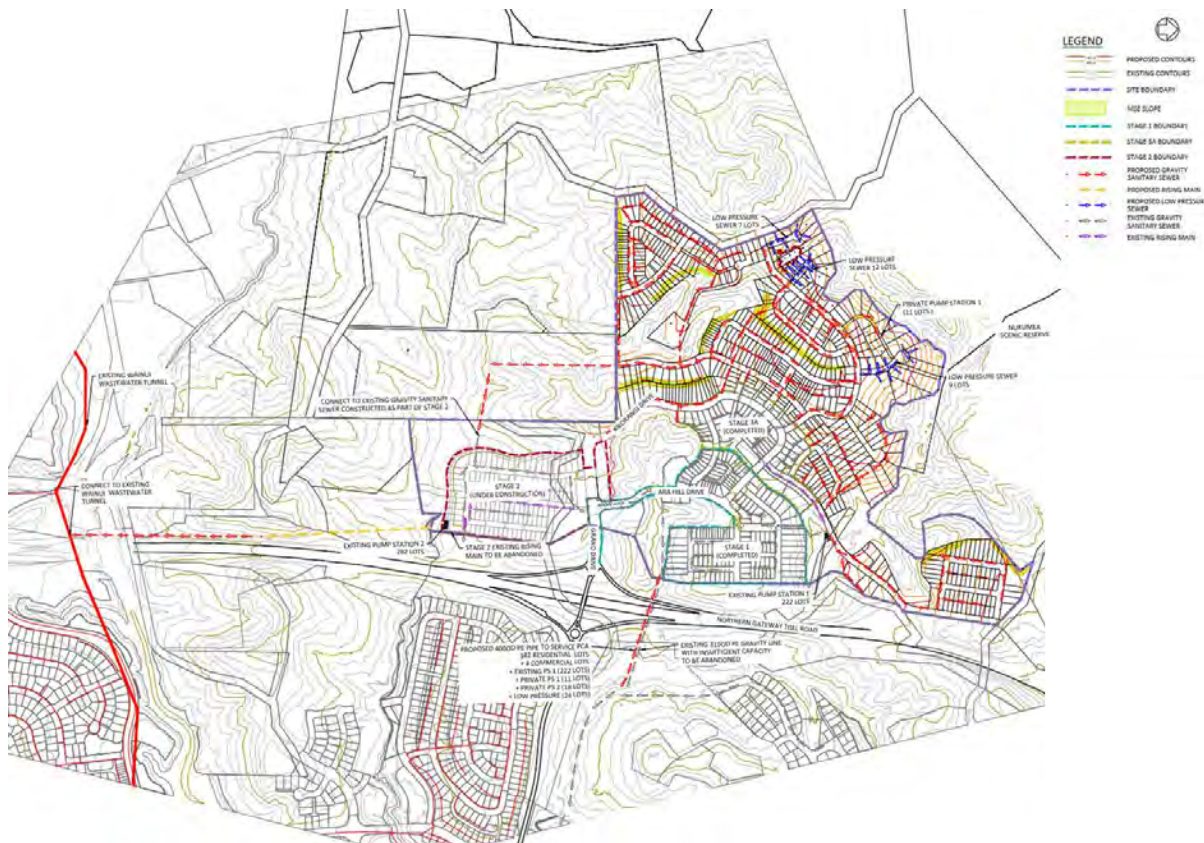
Proposed Indicative Wastewater Plan Option 2
